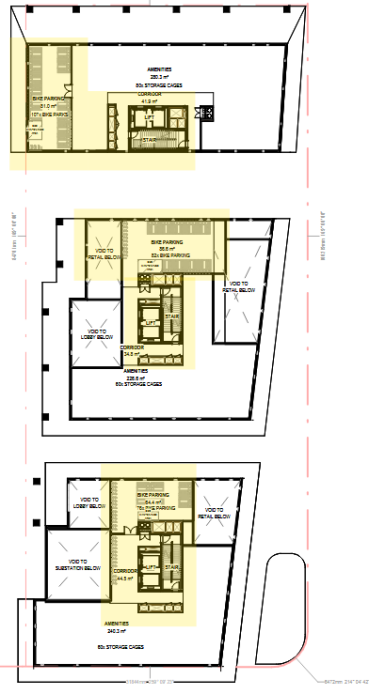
Drawing DA9701 Public Notification Level 1 floor plan
